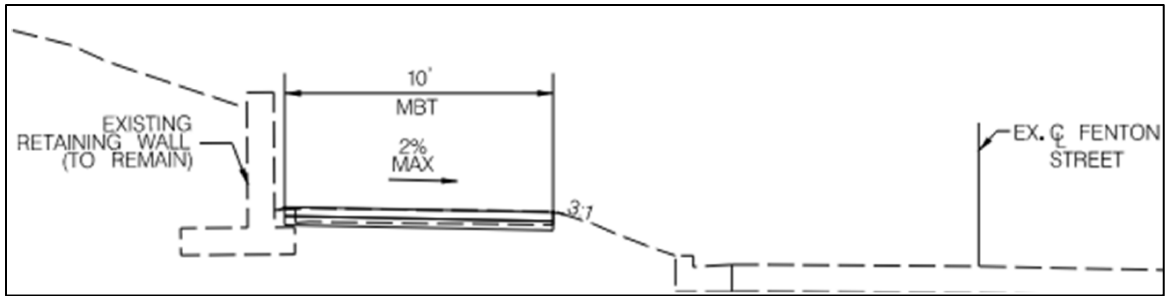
Proposed Cross Section - Trail at Station 65+50 Looking North
